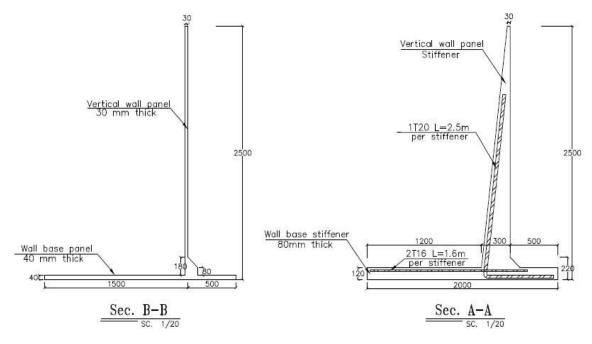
Sections A-A and B-B of the precast UHPFRC cantilever retaining wall
